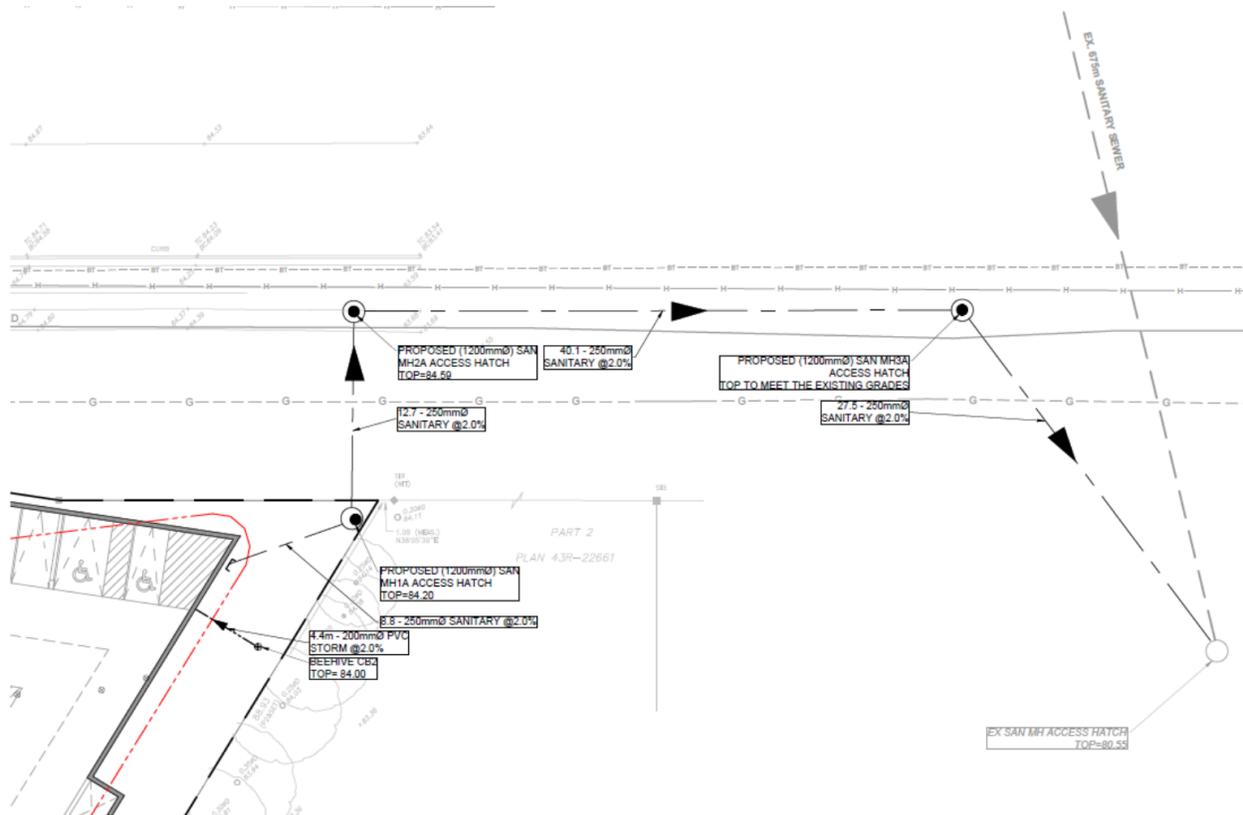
Detail of Site Servicing Plan prepared by Lithos Group Inc.
